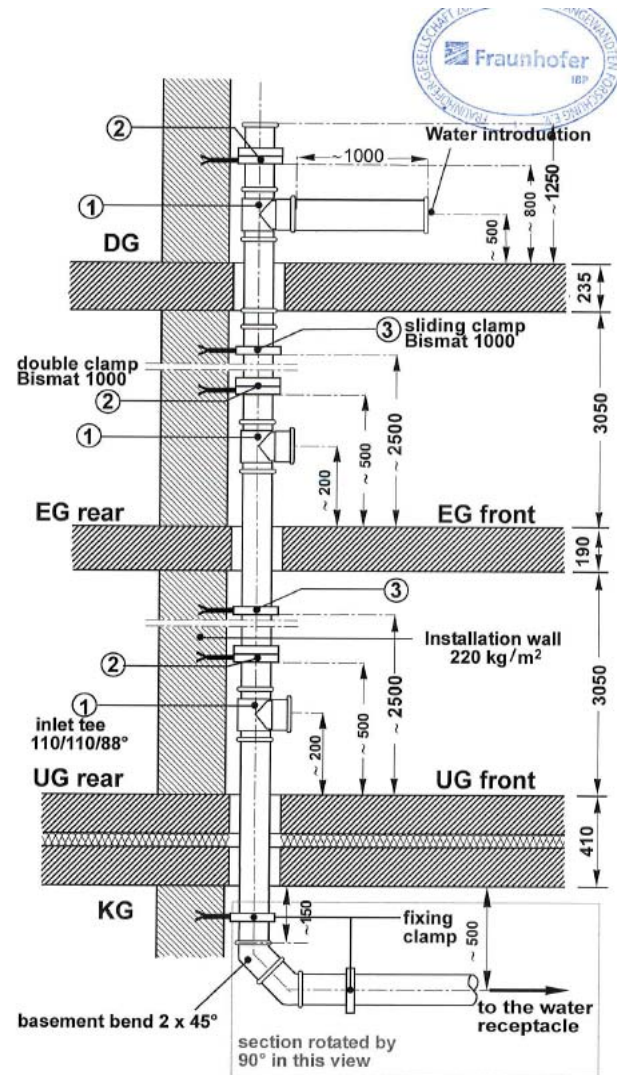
Installation plan of the pipe system "PLASTIFER SILENCE, 110 x 3.2" mounted with acoustic steel pipe clamps "Bismat 1000". Drawing not to scale, dimensions in mm.
